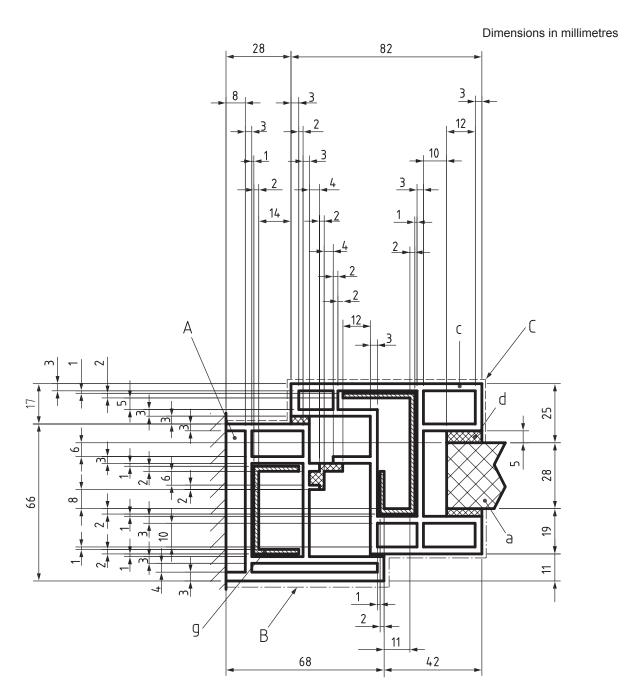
PVC frame section with steel reinforcement and insulation panel ( $b_{\rm f}$  = 110 mm)
